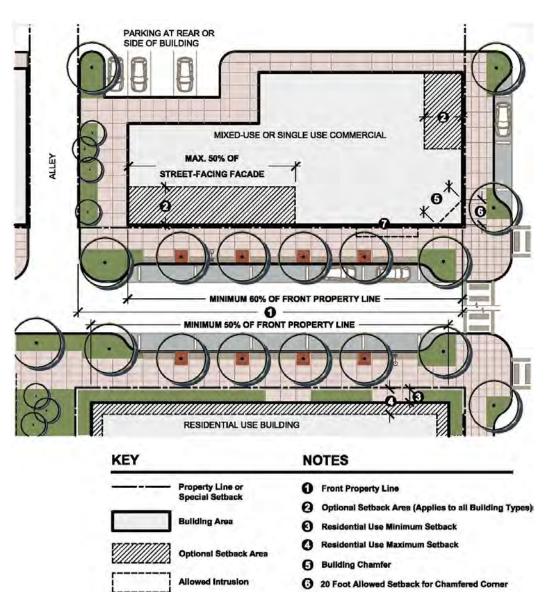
(6)(a) S-SW Zone Building Frontage and Setbacks.
